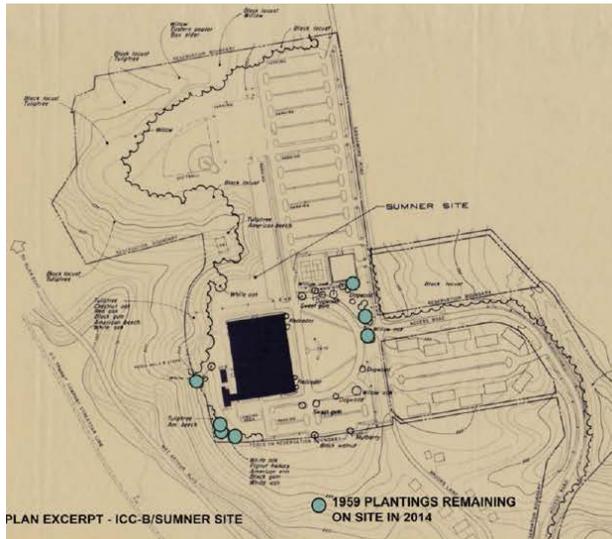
1959 Archival Planting Plan showing trees remaining in blue.
